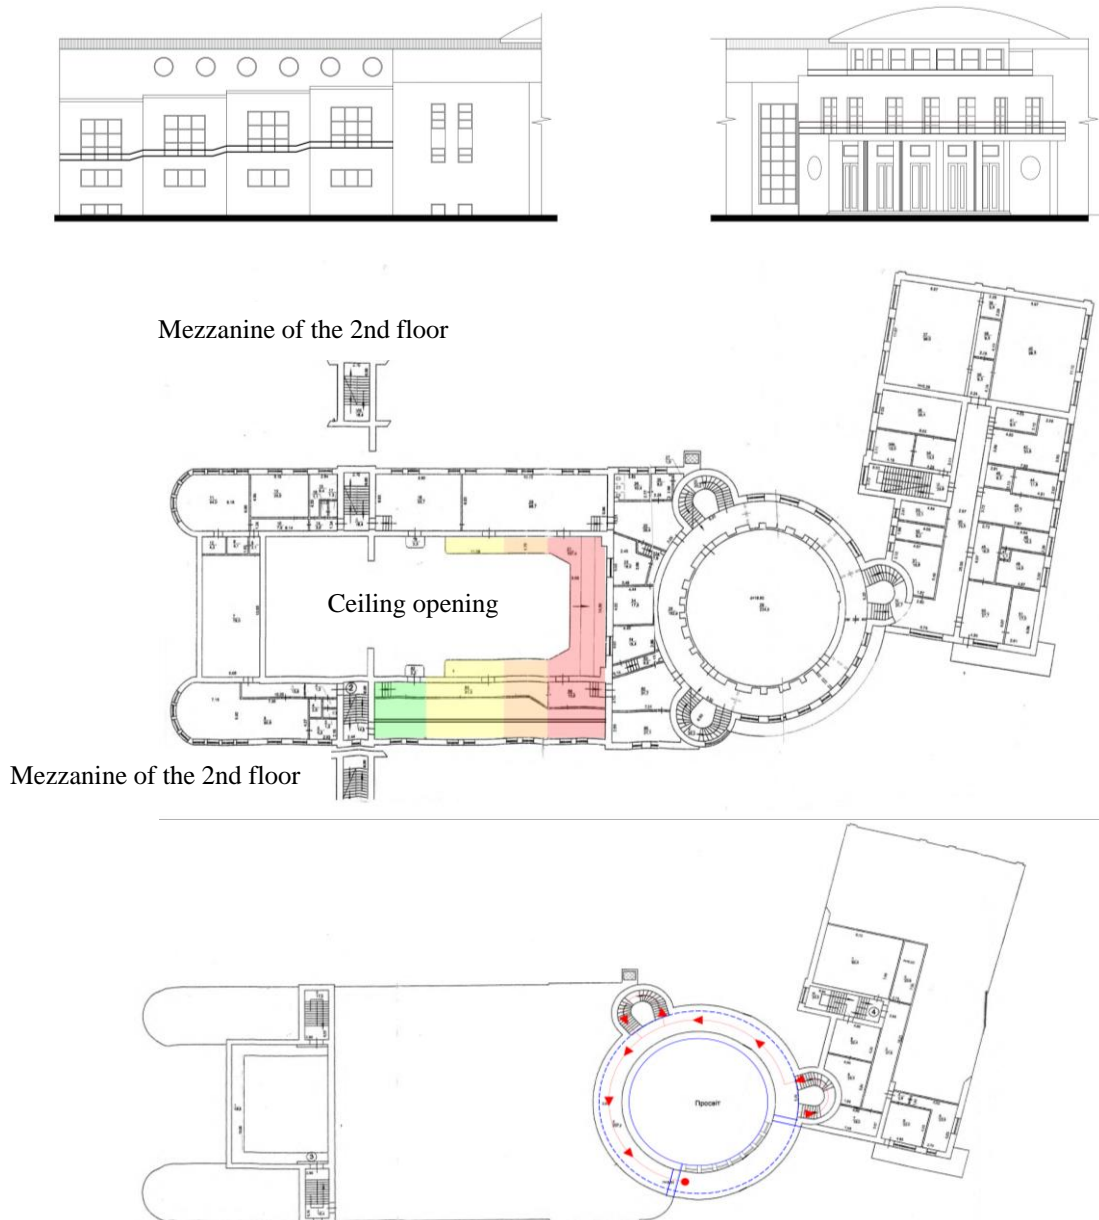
Attempt to reconstruct the original design by M. Shekhonin (facade fragments, plans of the 2nd and 3rd floors)
